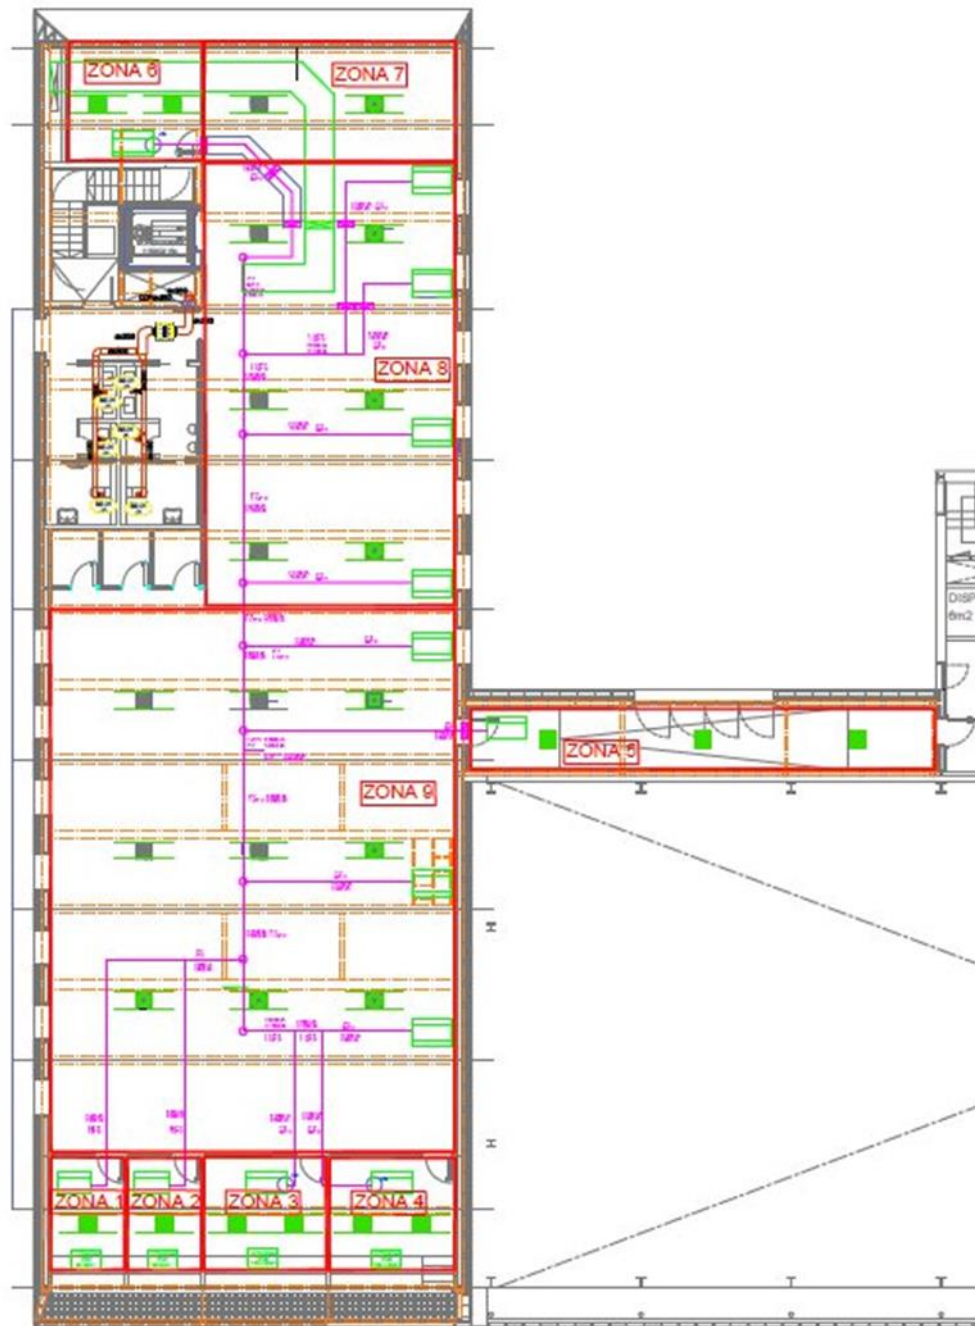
Office floor plan with HVAC sectorisation and virtual zones layout in Front Runner 6
